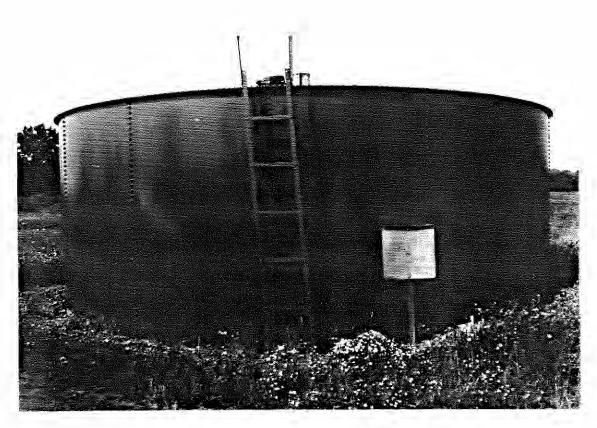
SEAD-50, 9/12/90. View of the Sulfide Ore Tank (Tank No. 17) located at the Tank Farm, facing north.
